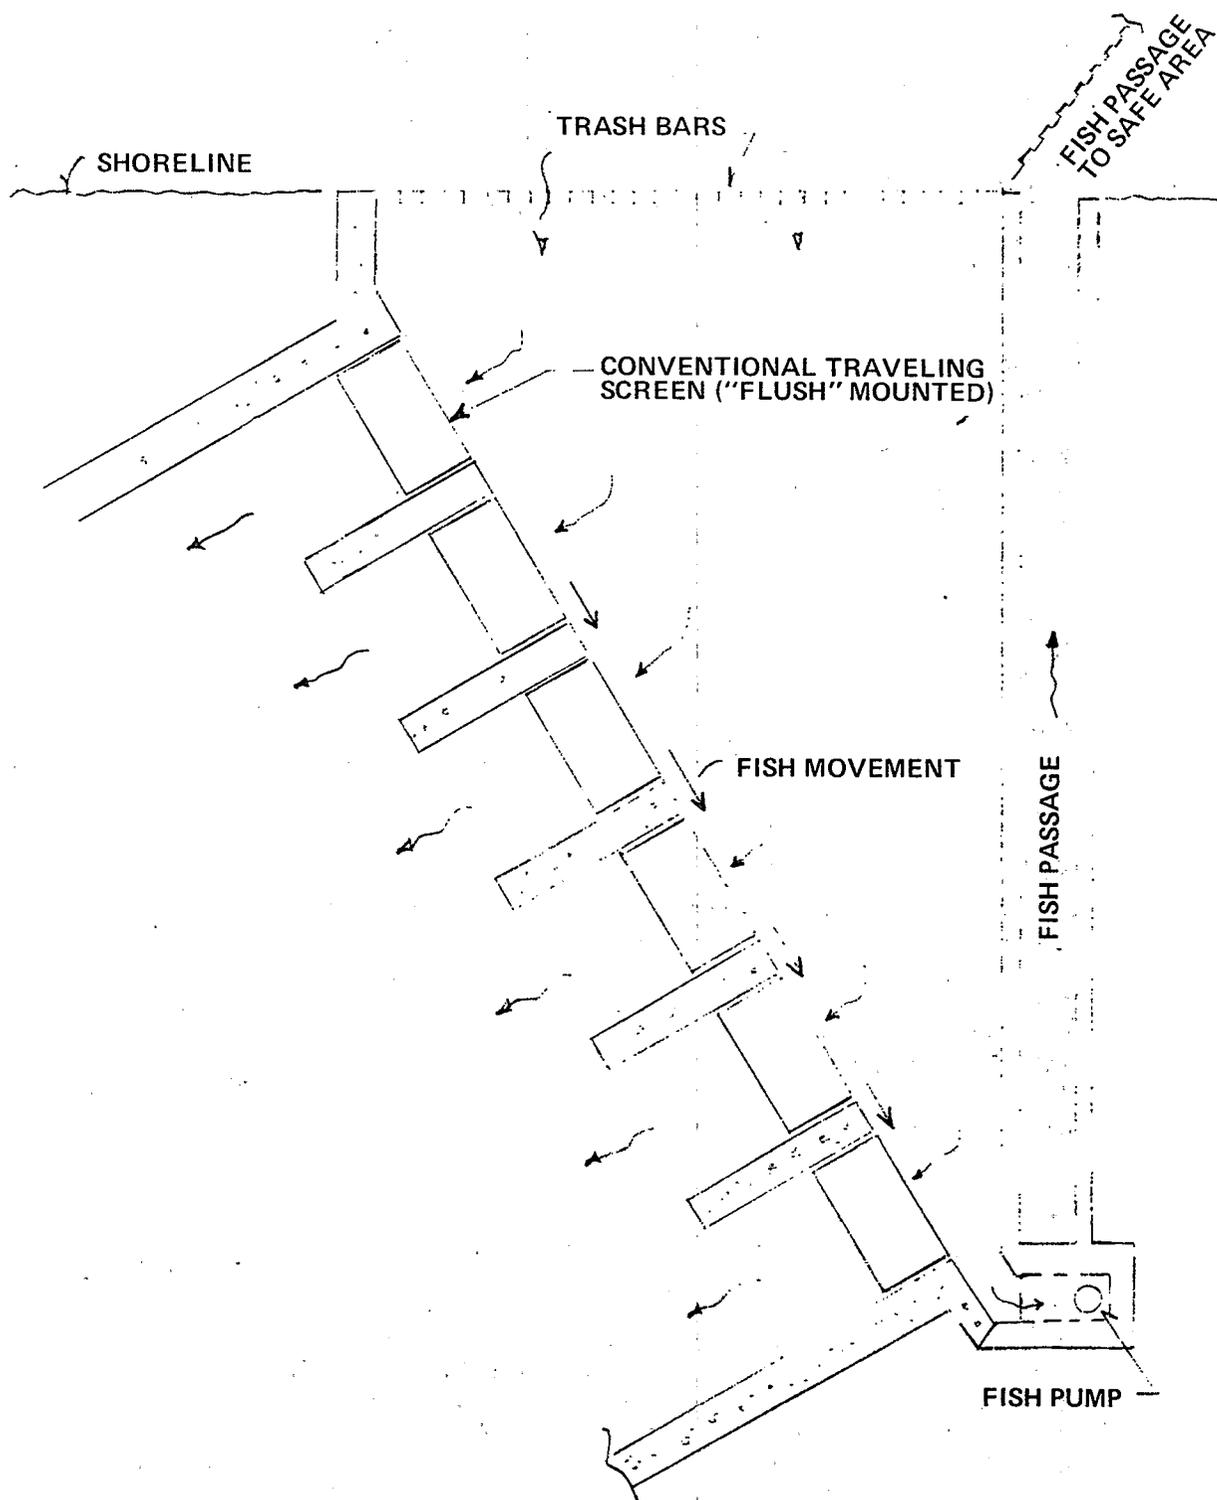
ANGLED CONVENTIONAL TRAVELING SCREENS
